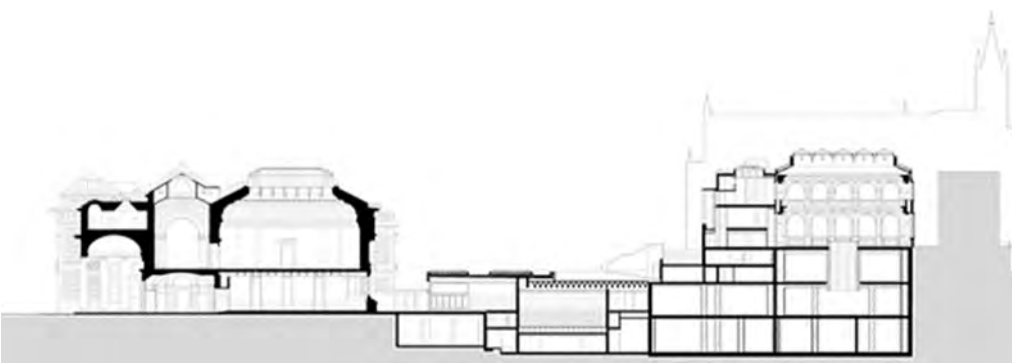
Transversal section of Prado Museum with the new extension. (Private collection SM)
